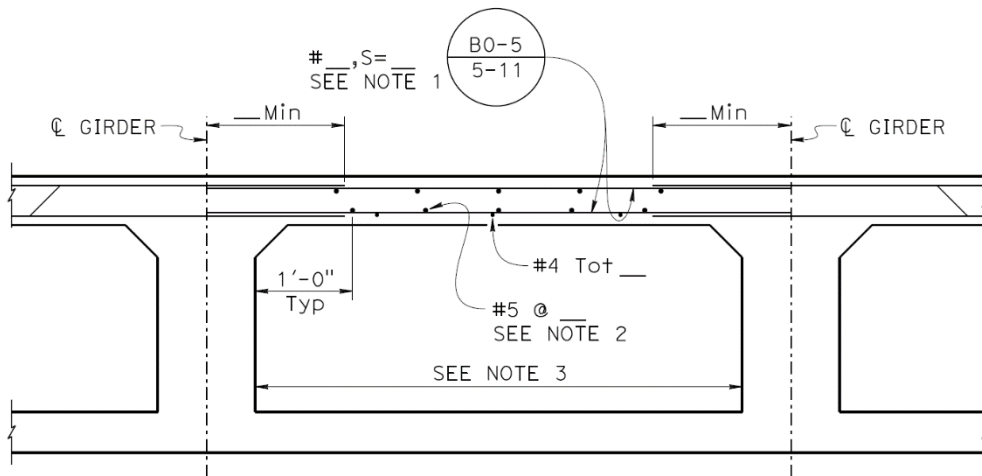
Transverse Reinforcement for Interior Girders
